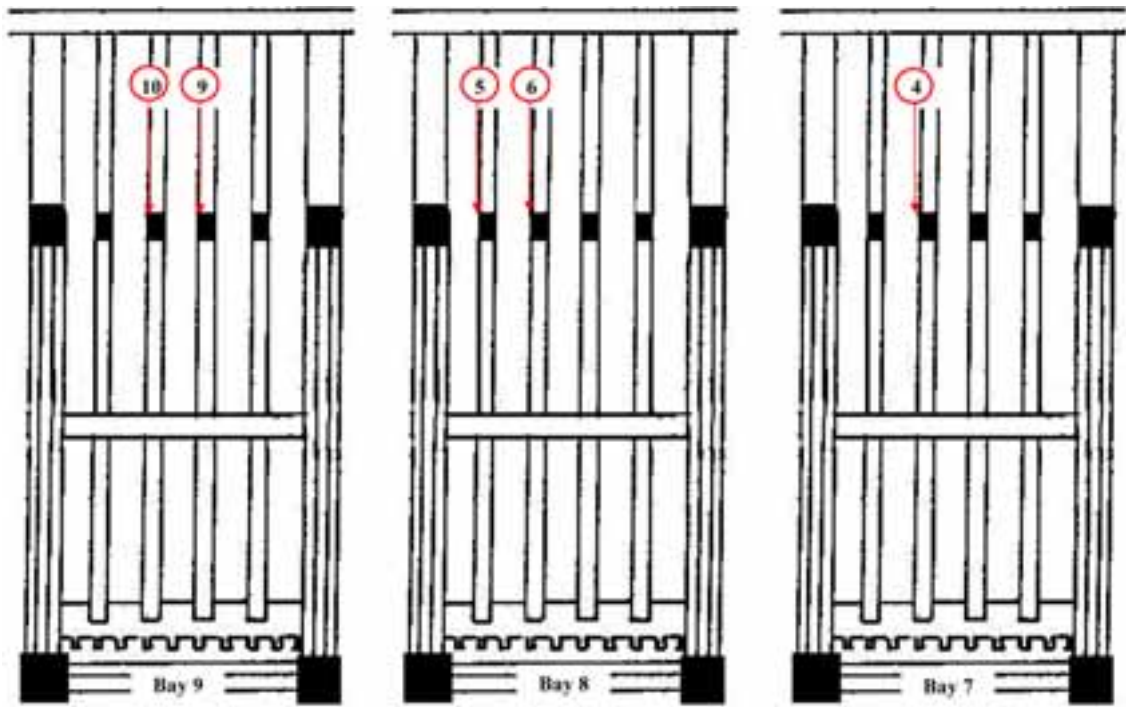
Western three trusses of the hall roof to show sampled timbers
